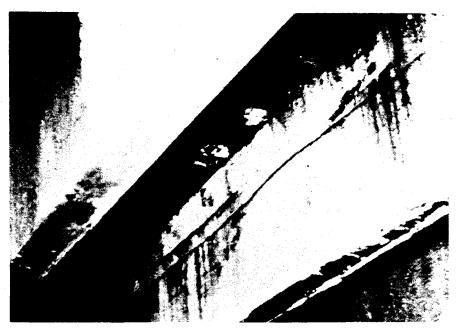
Horizontal Shear Crack in a Timber Beam
